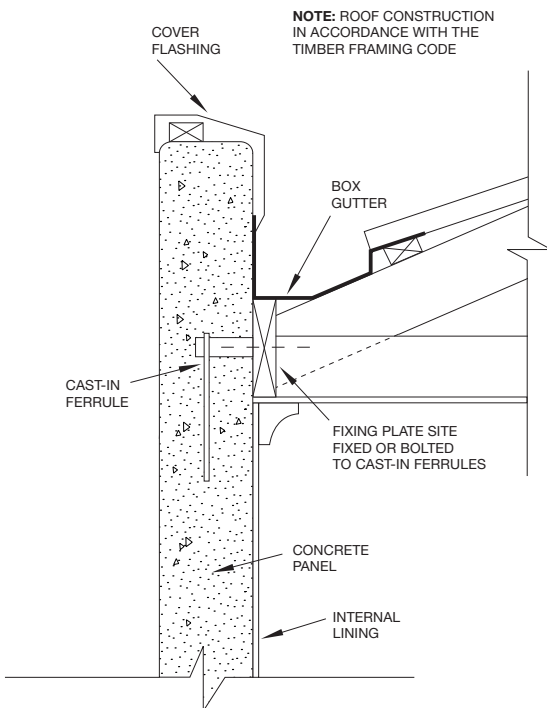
Panel to Parapet Roof Connection. (Roof framing is supported by wall panel via bolting into cast-in ferrules)
